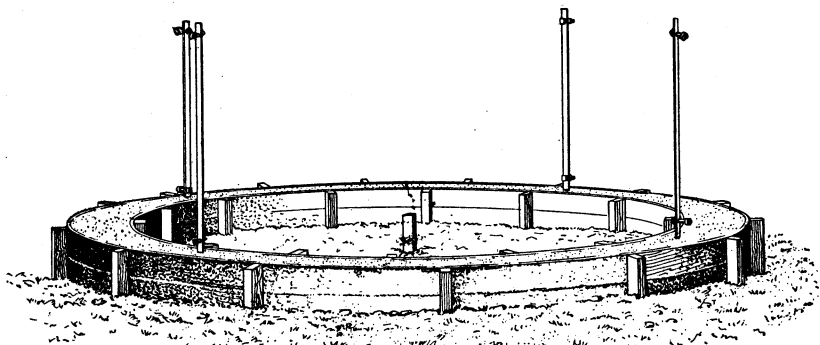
Foundation for wooden-hoop silo, showing anchor irons.
